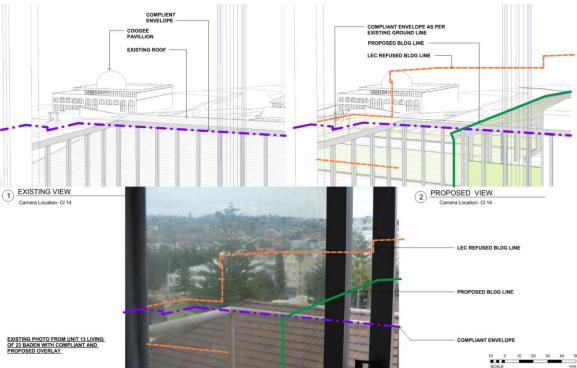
View analysis - 13/23 Baden St living room - view 1 (Source: Legge & Legge Architects)
